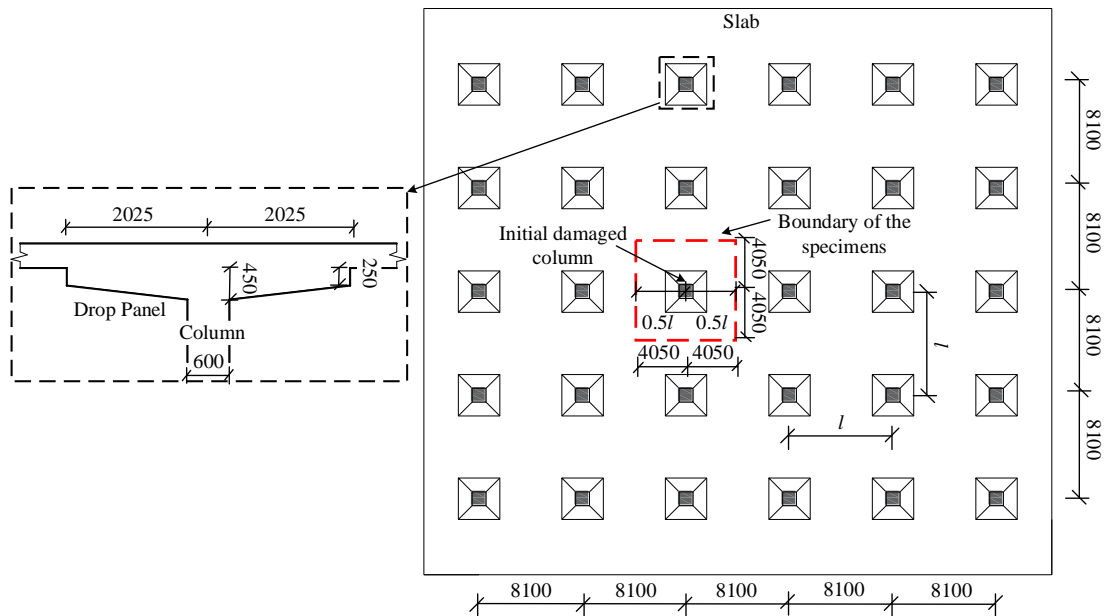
Plan view of the simplified prototype structure (unit: mm).
